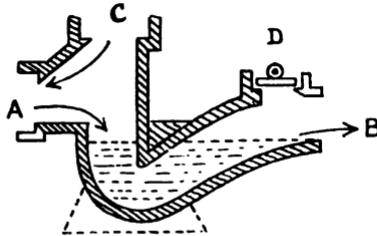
Buchan's Disconnecting Syphon. The sewage enters at A and escapes into the sewer pipe at B. D is an access opening in case of an obstruction. C communicates with the outside air, and ensures the air in the stable pipe being pure.
